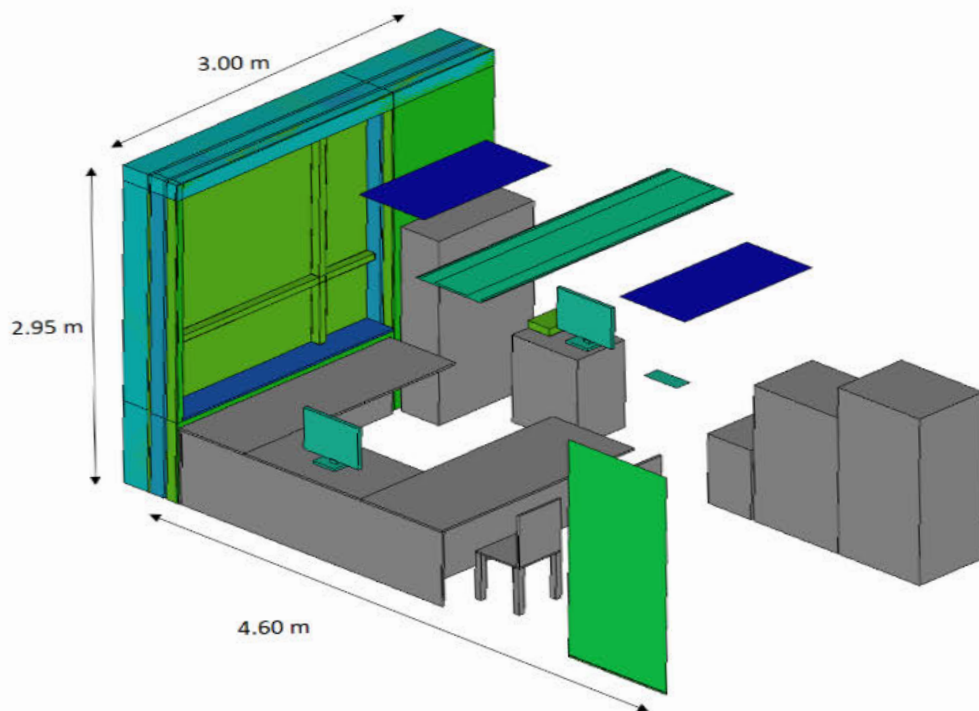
Dimensions and Layout of the Office (Test Room 1) at Second Floor
